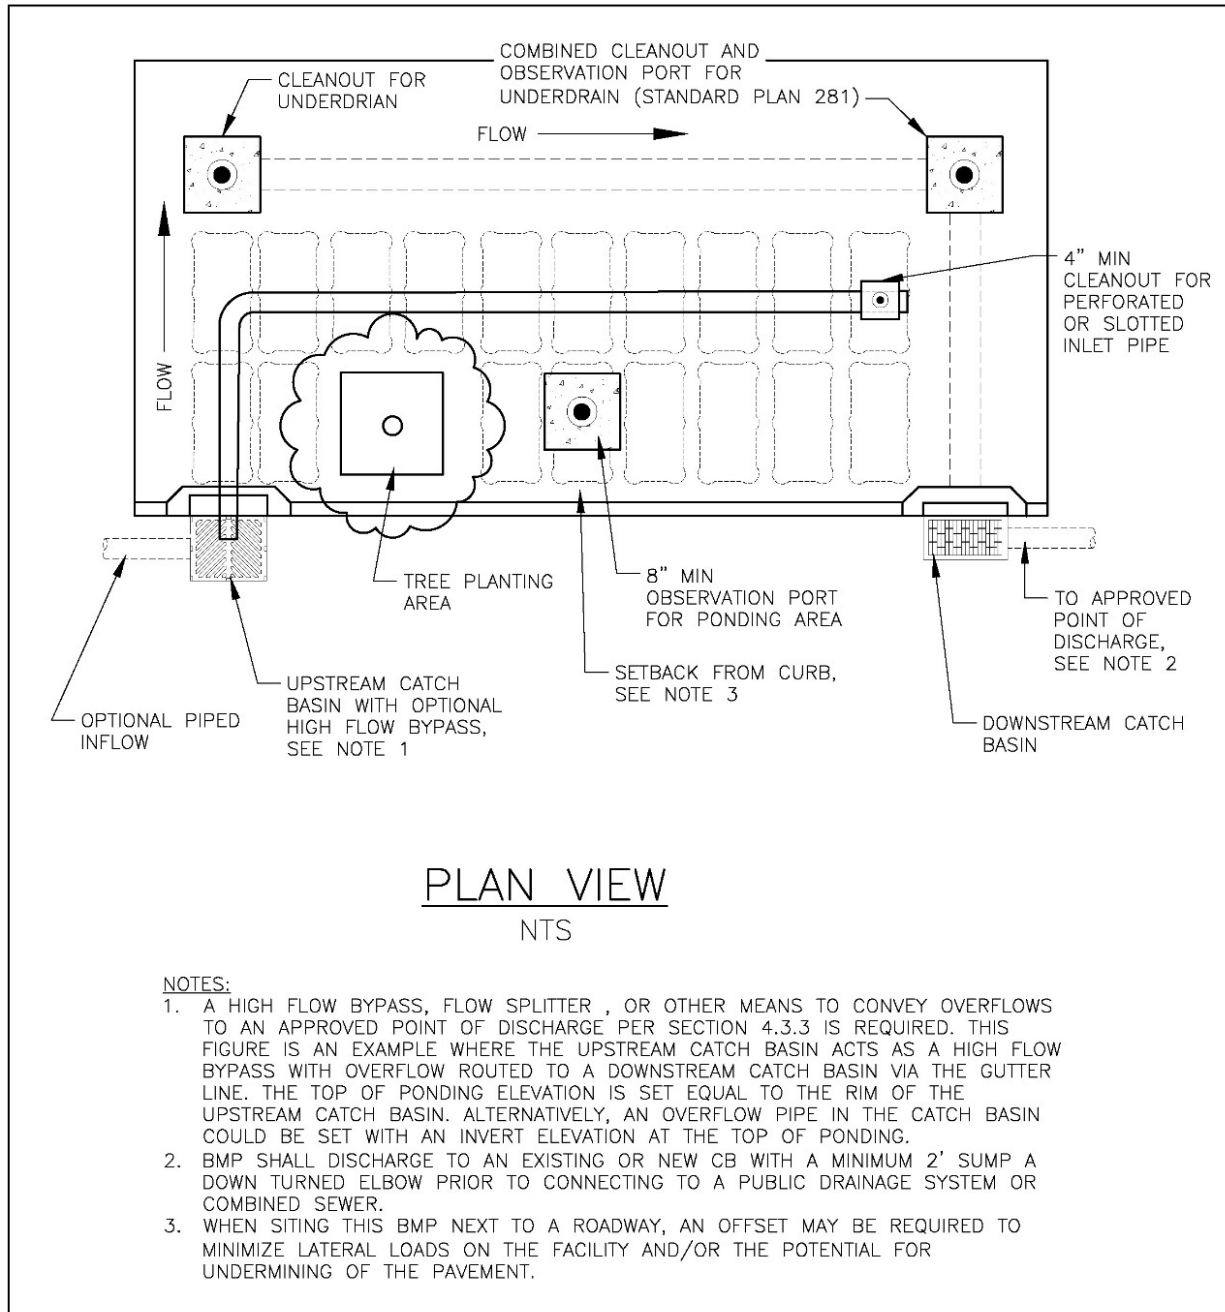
Infiltrating Soil Cell Bioretention (with Underdrain) Plan.
